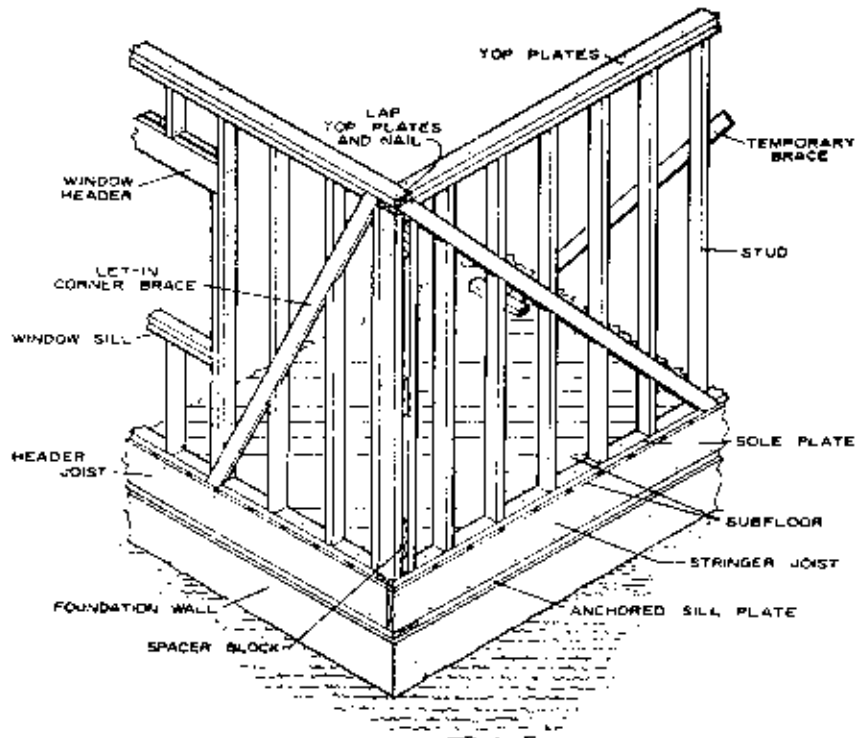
Exterior wall framing, platform construction. (U.S. Department of Agriculture)
